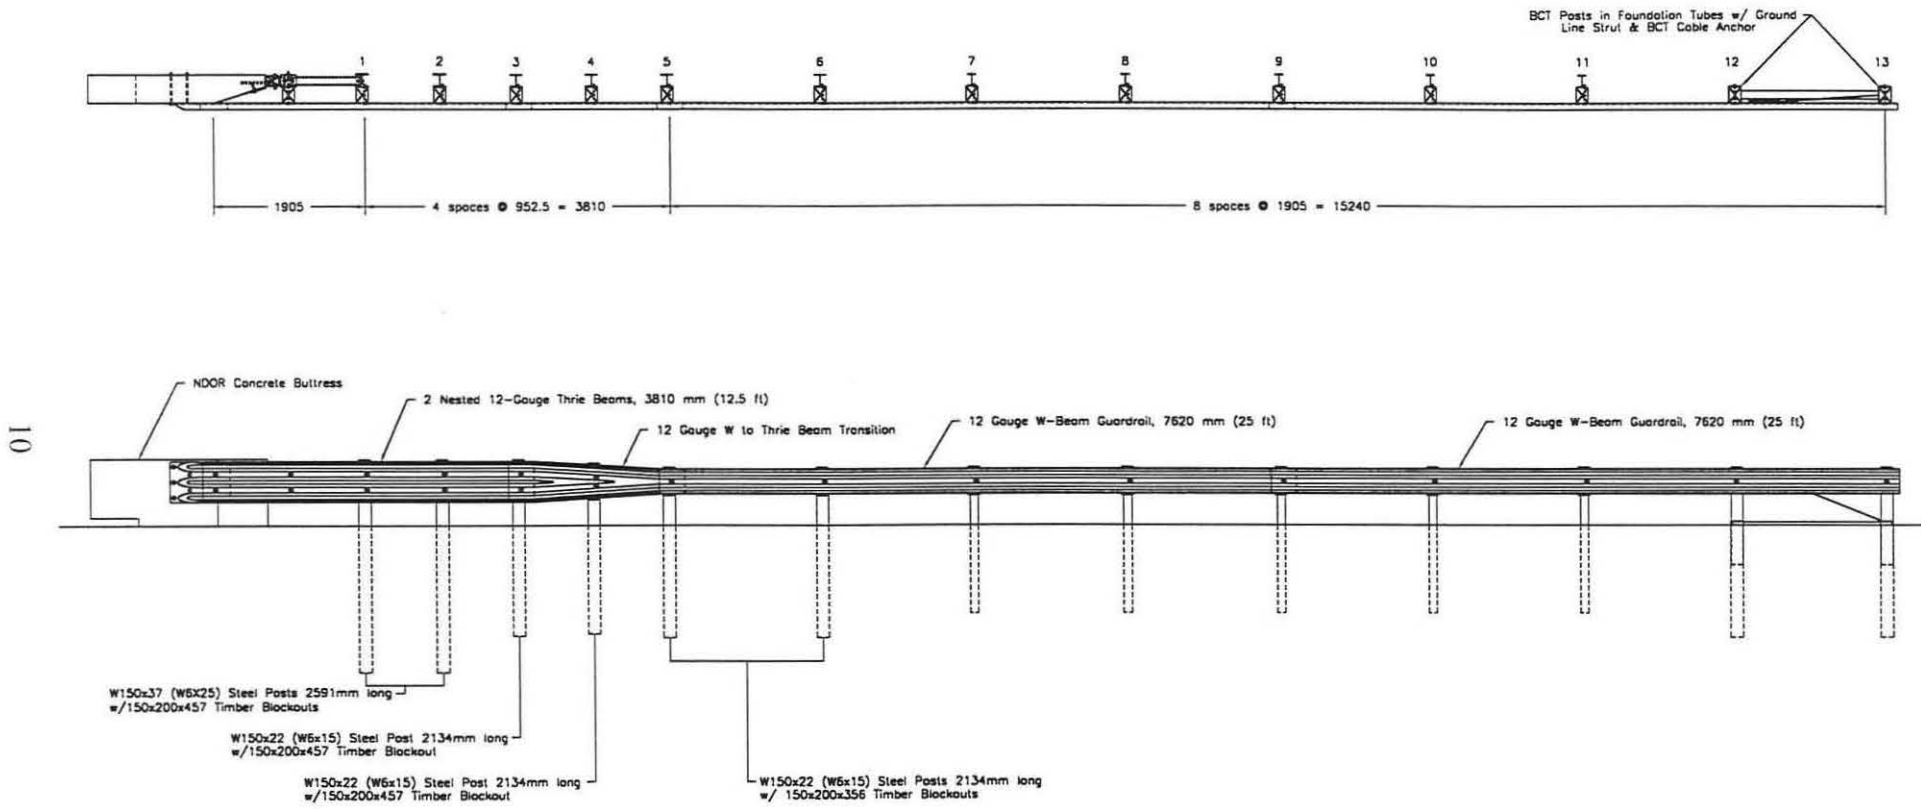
Layout and Design Details for Nested Thrie Beam Transition
